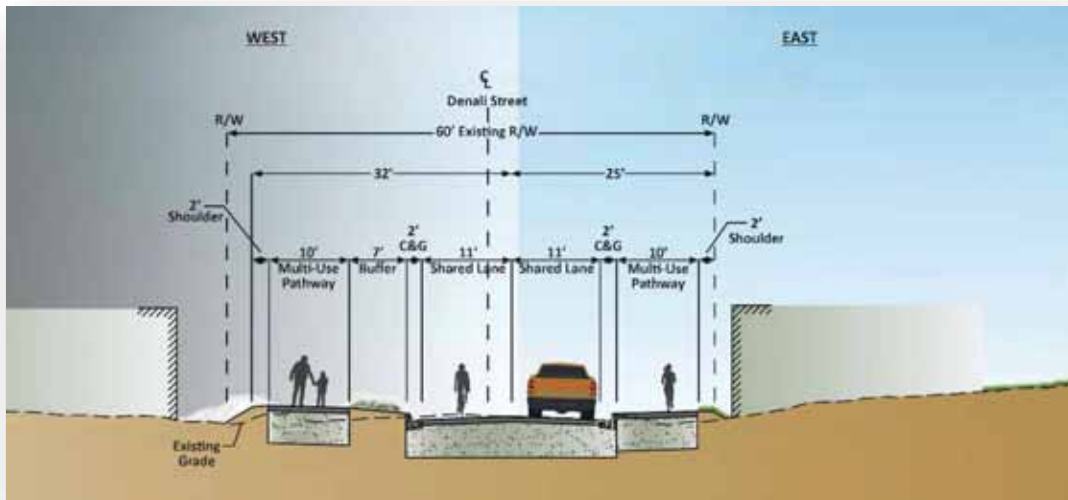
Denali Street (Northern Lights Boulevard to Fireweed Lane) – Alternative 3
